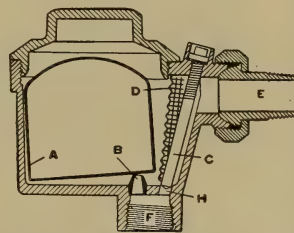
Automatic Vacuum Valve, Illinois Engineering Co.
